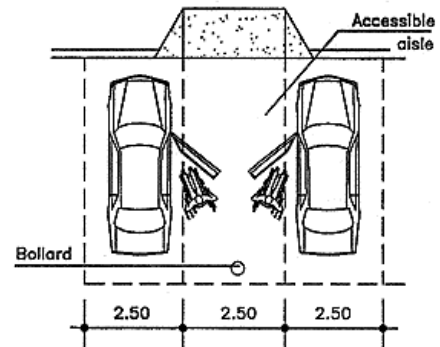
Creation of Handicapped Parking Space within Existing Row of Parking
